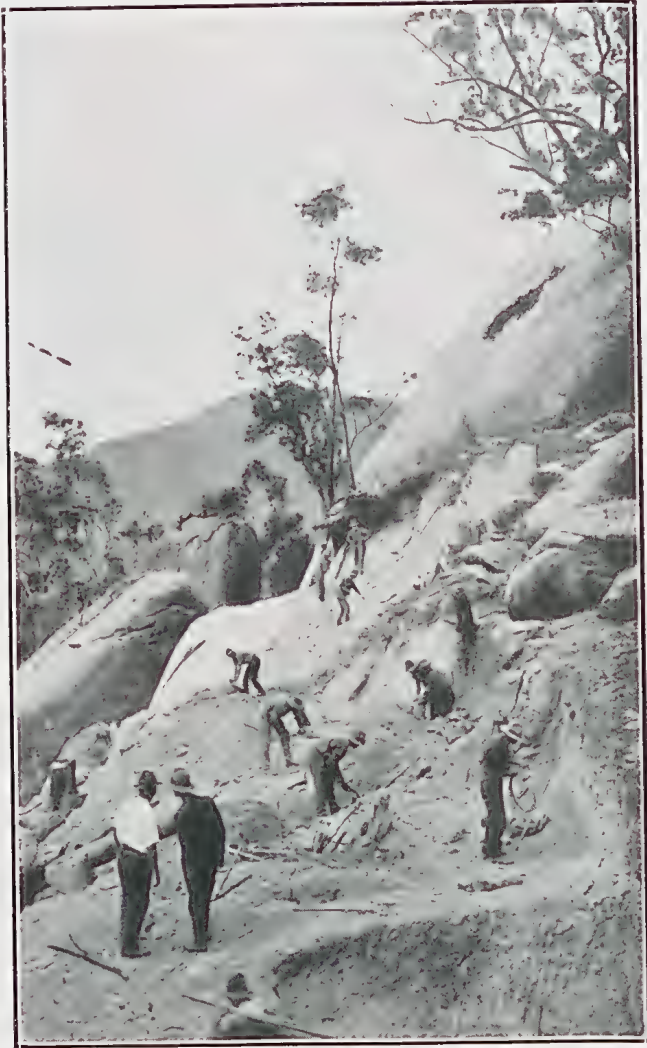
CAIRNS—TABLELAND ROAD. MEN WORKING MACHINE ROCK DRILLS.
